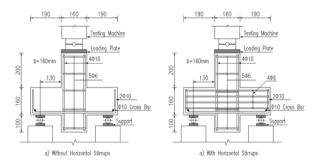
Corbels Geometrical and Steel Reinforcement Details[3]
